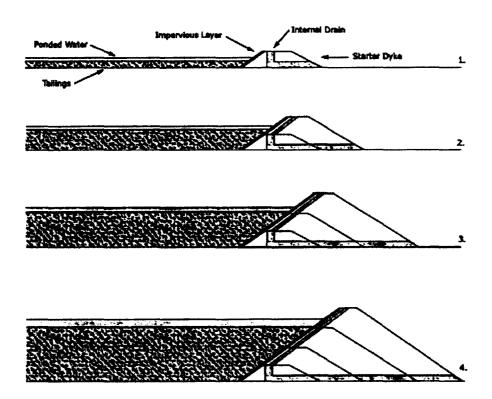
Stages of downstream method of raised embankment construction (Vick 1990)
